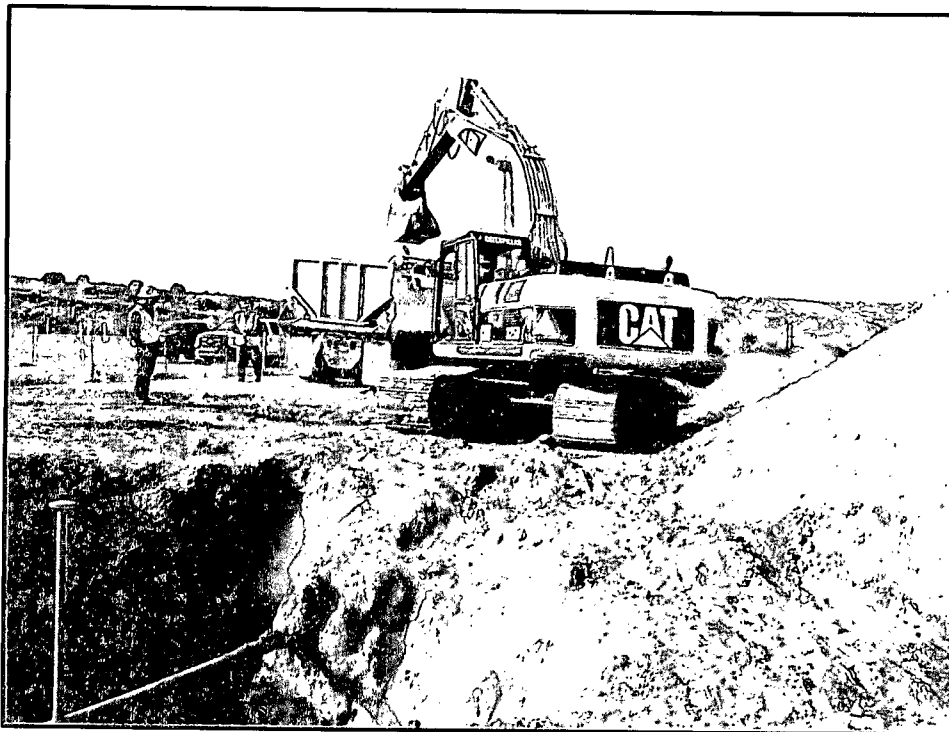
Photo of the excavated soils being exported from the Santa Rosa 8 #2 pipeline release site.
